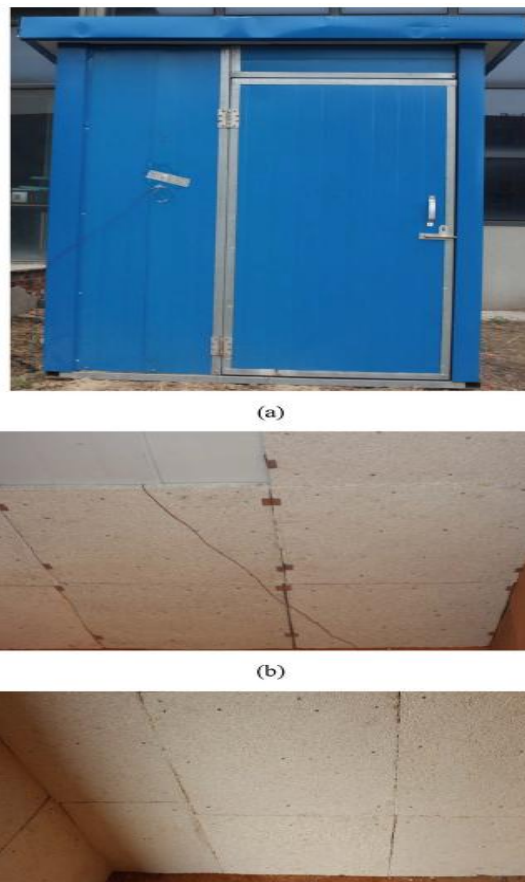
(a) Test room photograph (b) Wallboard with shape stabilized PCM on the roof
